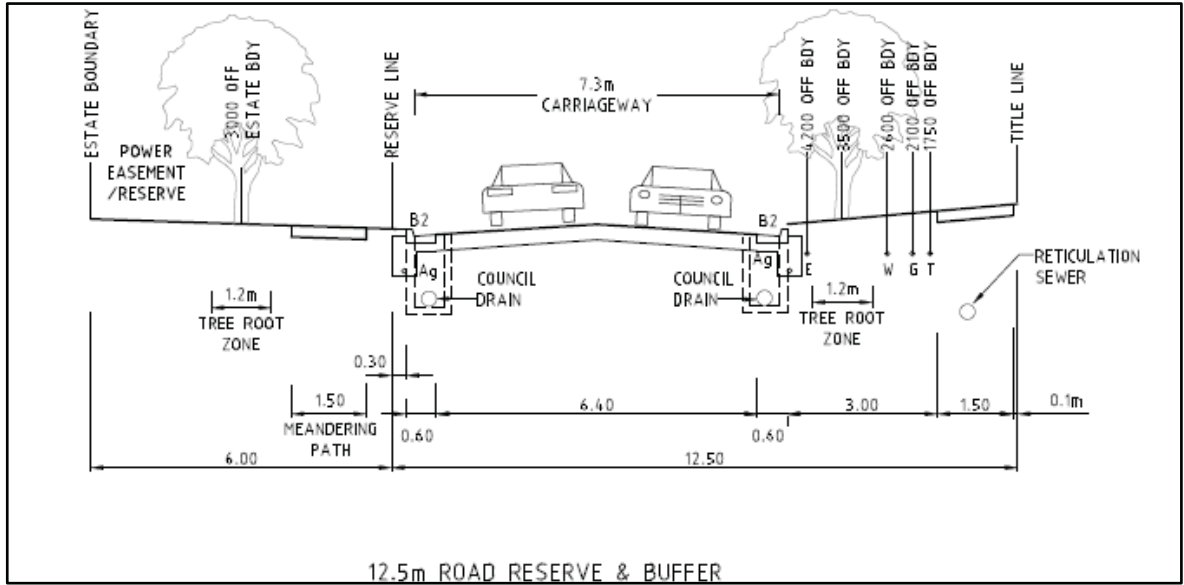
Local Access Road Cross Section Adjacent Drainage Reserve (12.5 metre)
